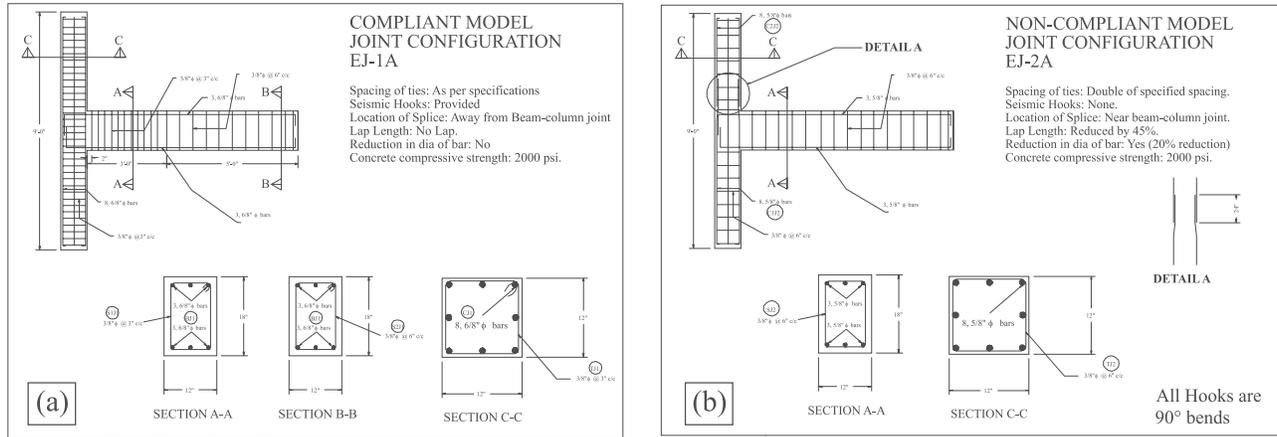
Reinforcement detailing of code-compliant beam-column connection EJ-1A (a) and non-code-compliant beam-column connection EJ-2A (b).
